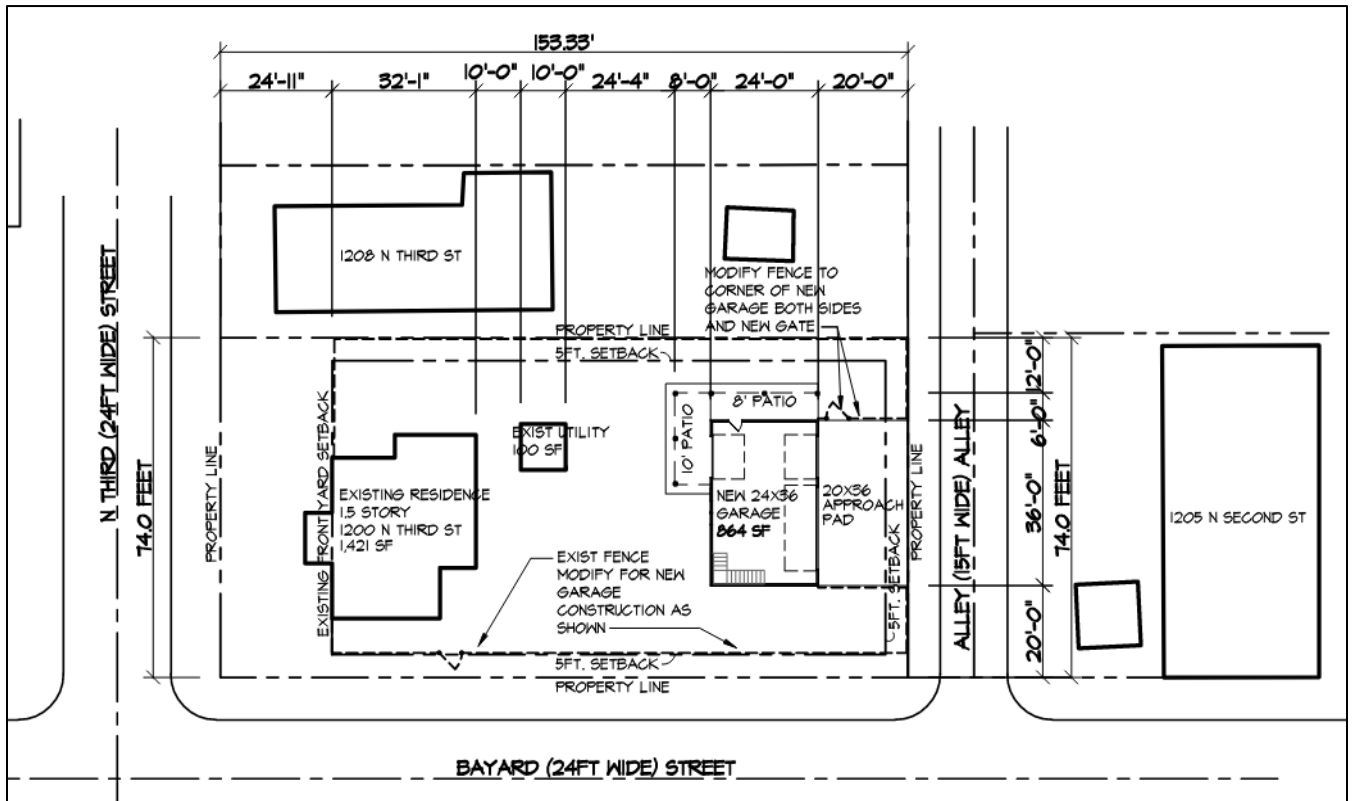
Site plan for proposed new garage at 1200 North 3rd Street.
